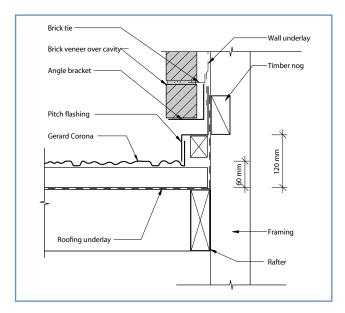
Nogging and positioning of pitch flashing for installation
